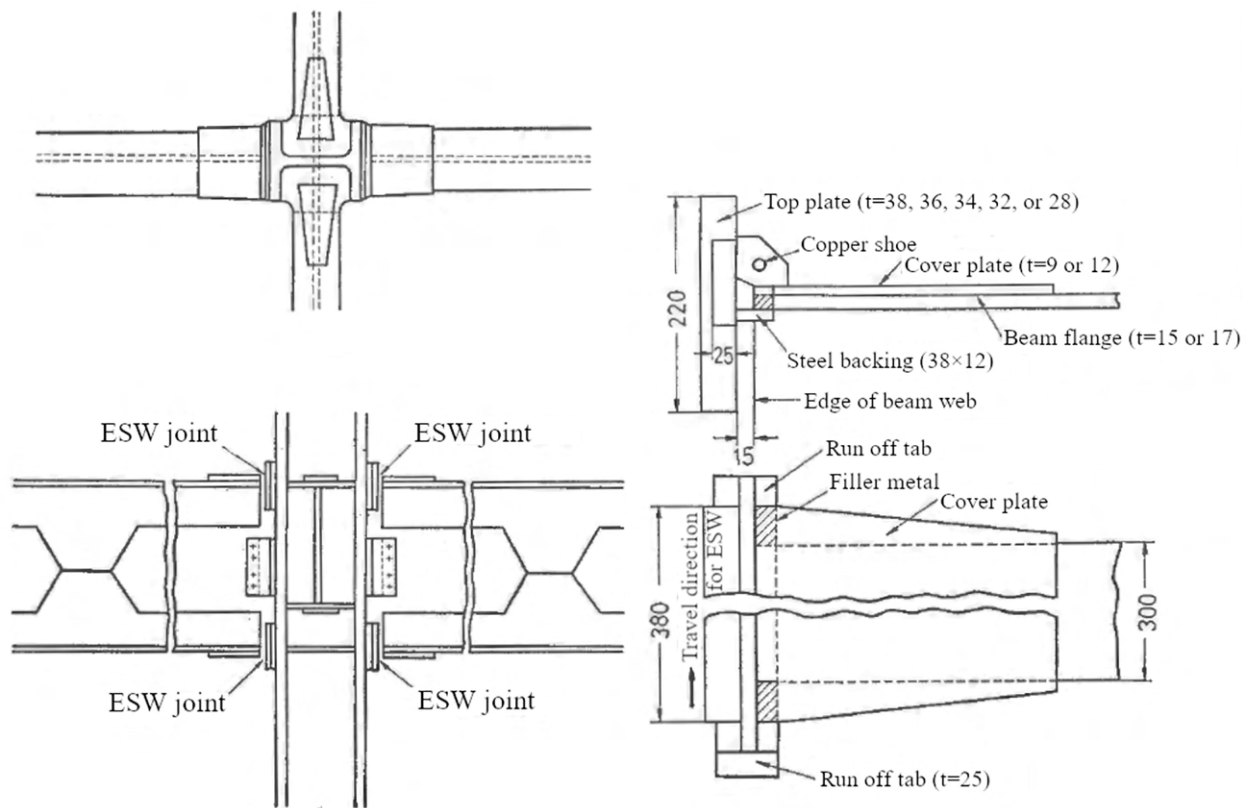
ESW applications in Kasumigaseki Building (unit: mm) (adapted from Ueno and Ariyasu, 1968).
